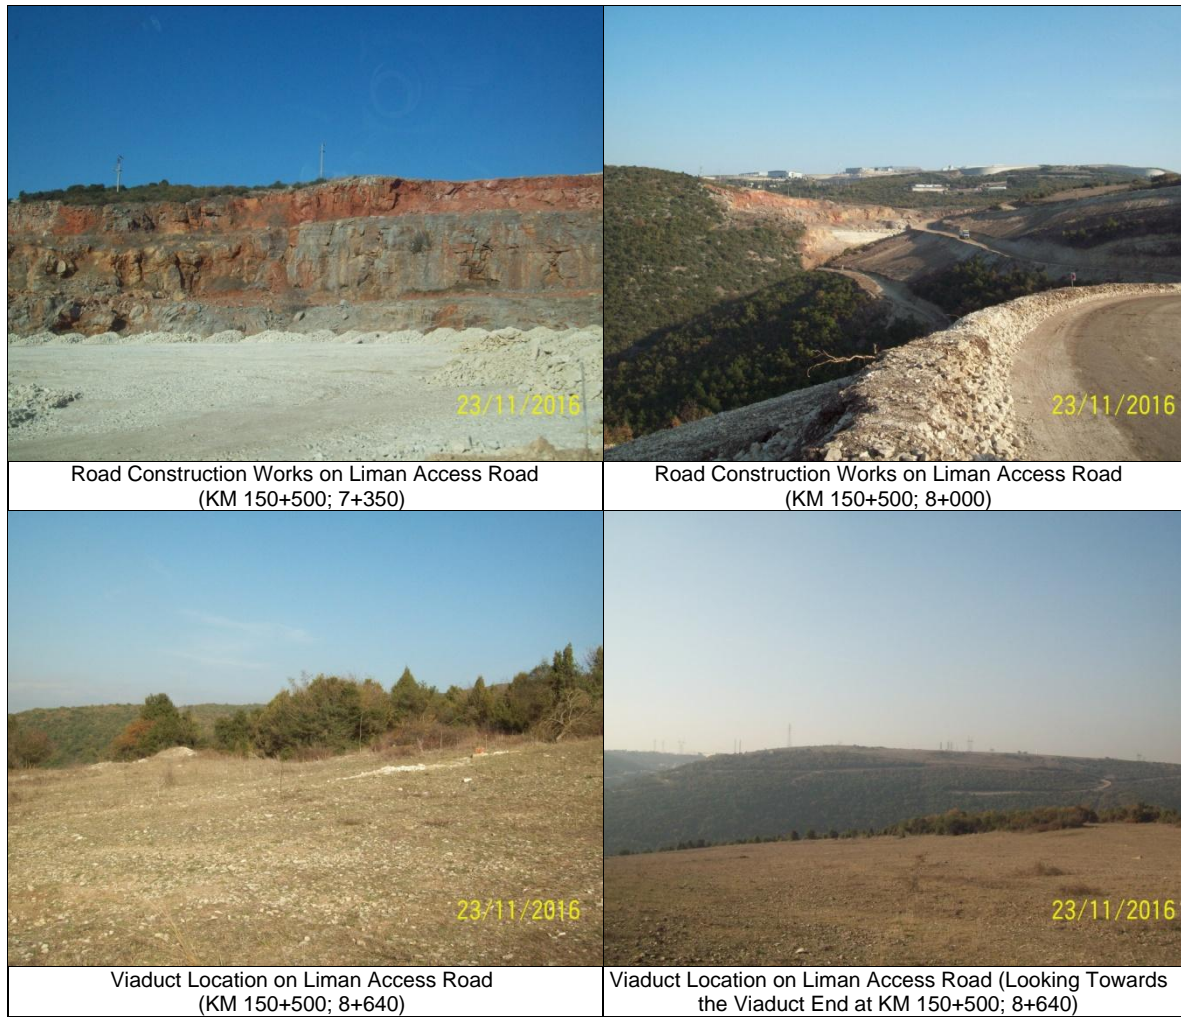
Photographs Showing Different Route Sections in Section 4
